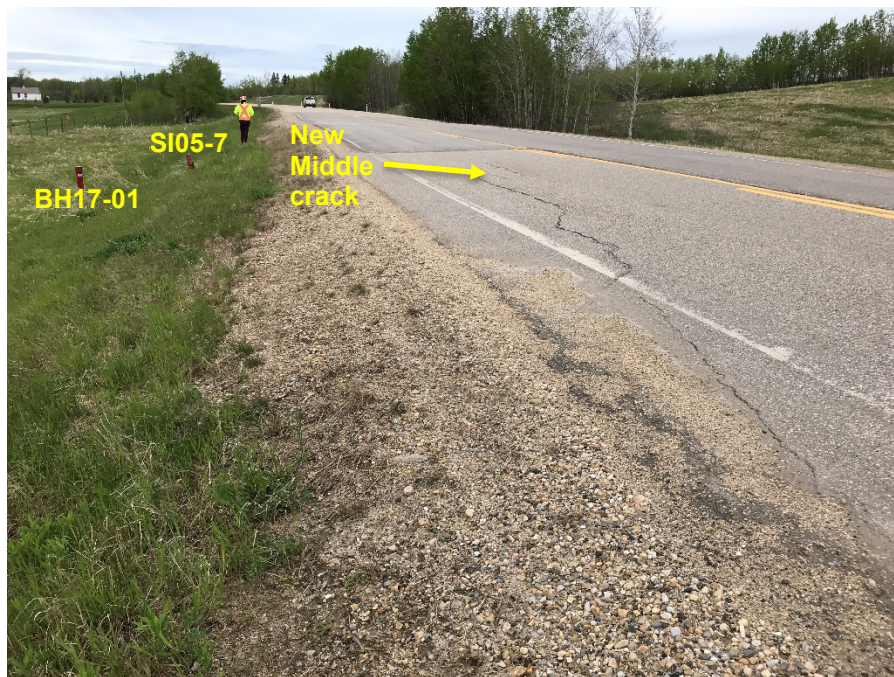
Pavement cracks at east limits of 2017 patch. Looking west.
